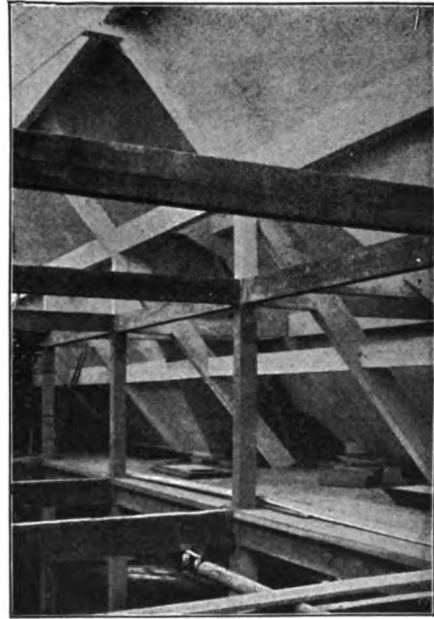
Reinforced concrete roof supports in the building of the “Münchener Neuesten Nachrichten.”
